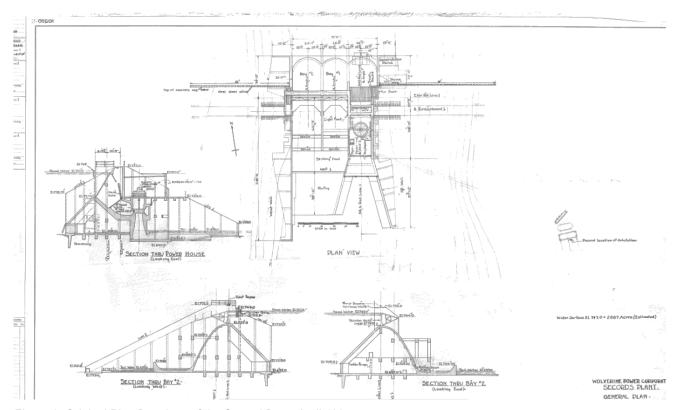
Original Plan Drawings of the Secord Dam, April 1924.
